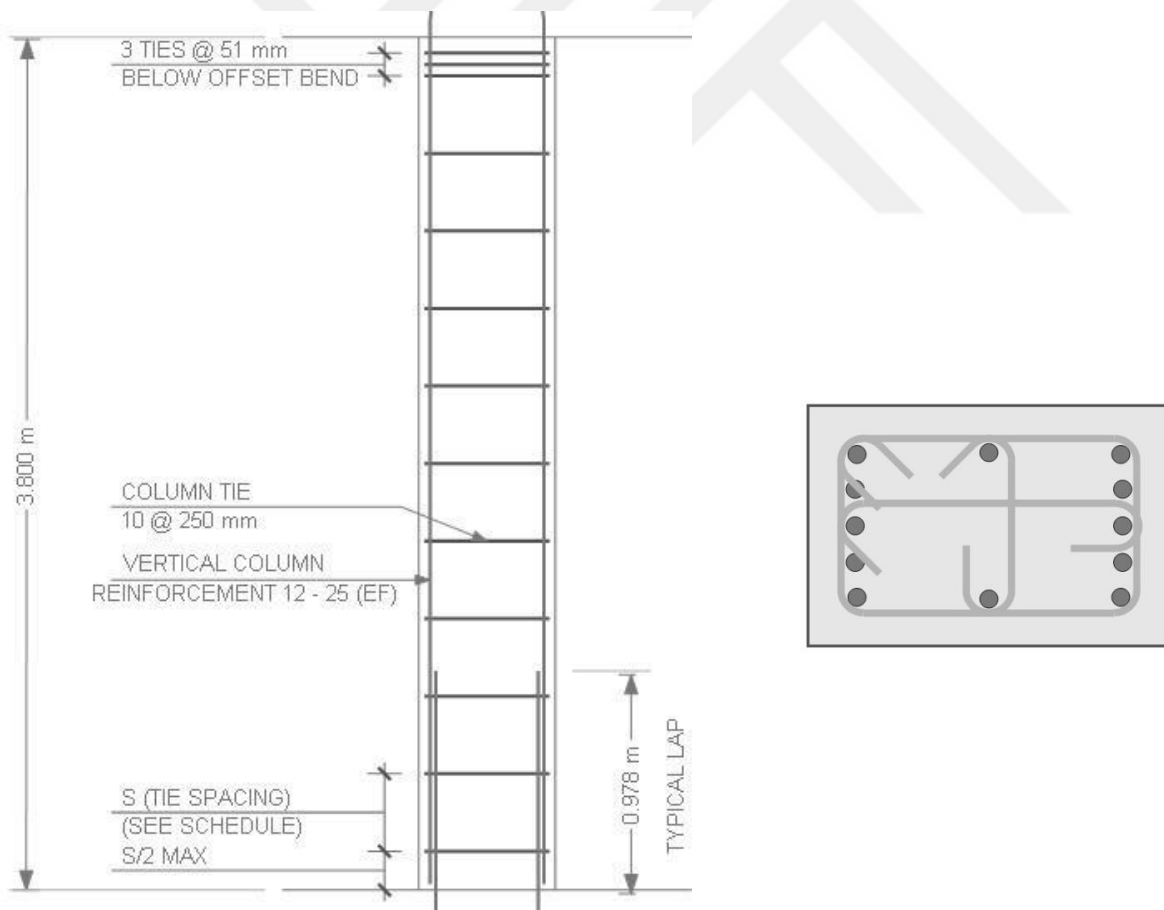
Reinforcement Detailing for Column (C1) story (1)
